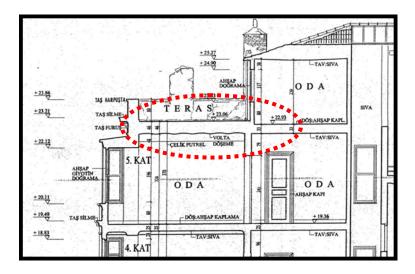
5th Floor arch and steel joist (taken from survey 1/50 scale A-A Section)
